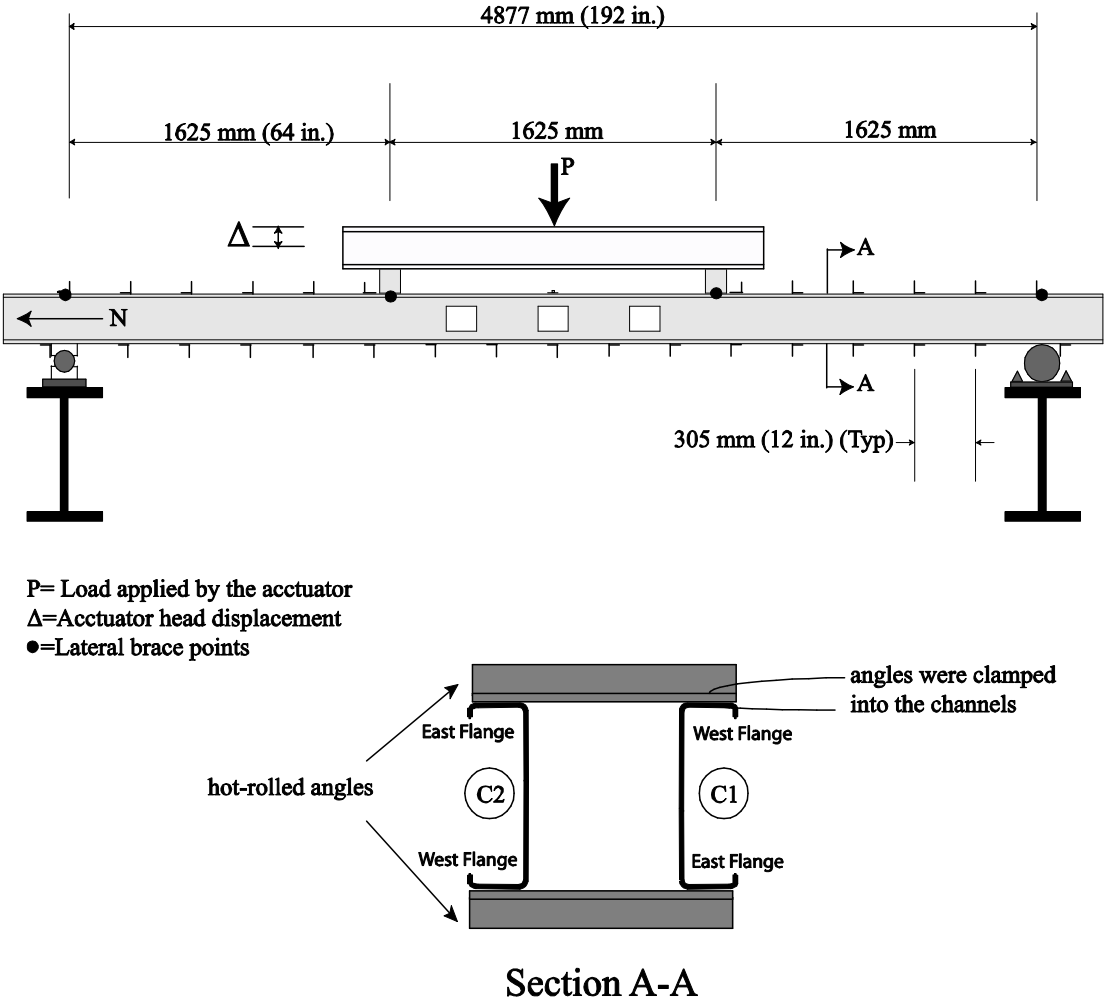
Cold formed steel beams are tested under four-point bending configuration
